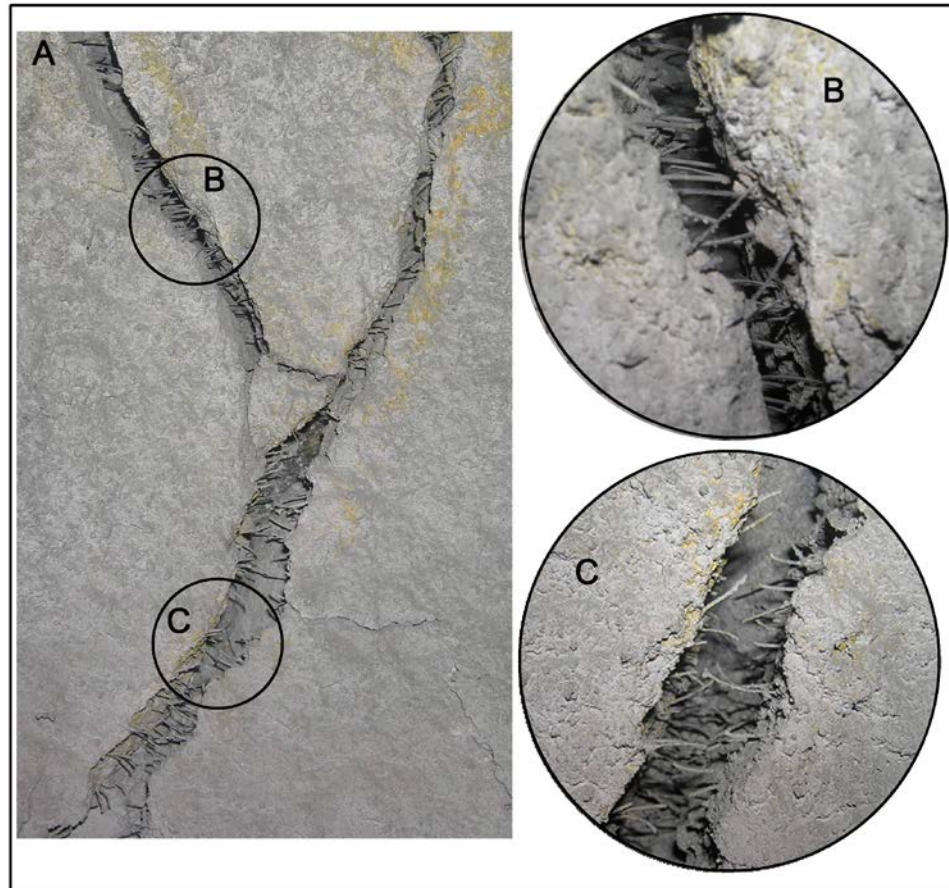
Cracked surfaces in a synthetic fibre reinforced shotcrete surface on a drive wall shown in “A” with magnifications at crack points “B” and “C”
